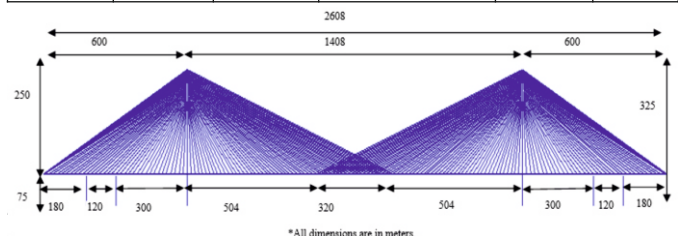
Elevation layout of self-anchored suspension of cross cable stayed bridge
